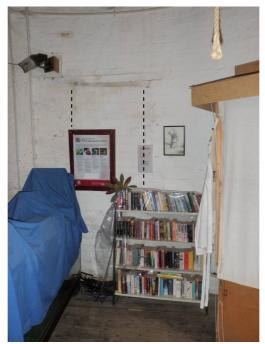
Ground Floor. Blocked doorway on south wall of windmill
